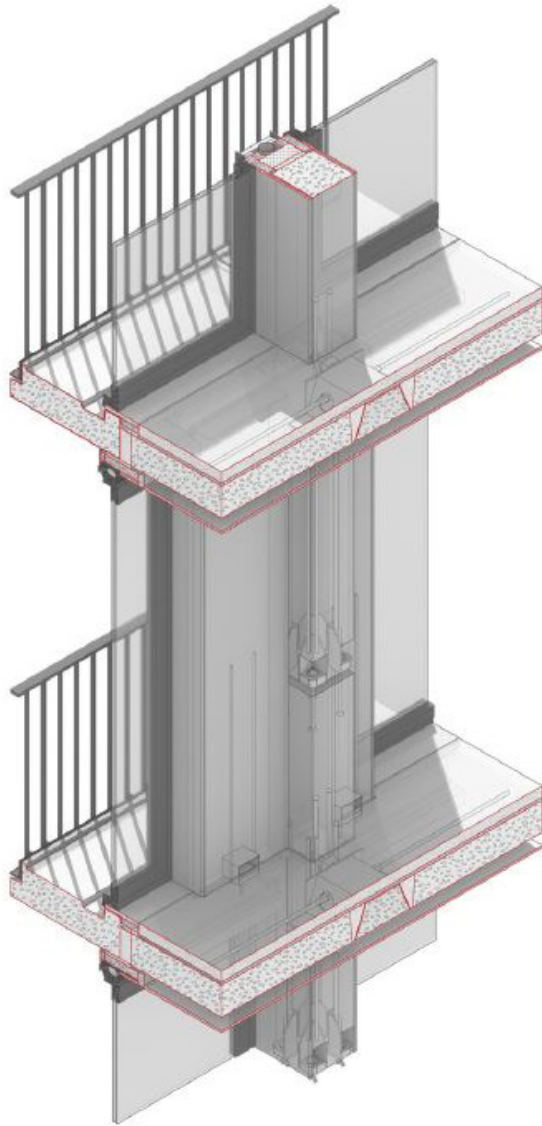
Facade detail [GAAGAA, n.d.]
